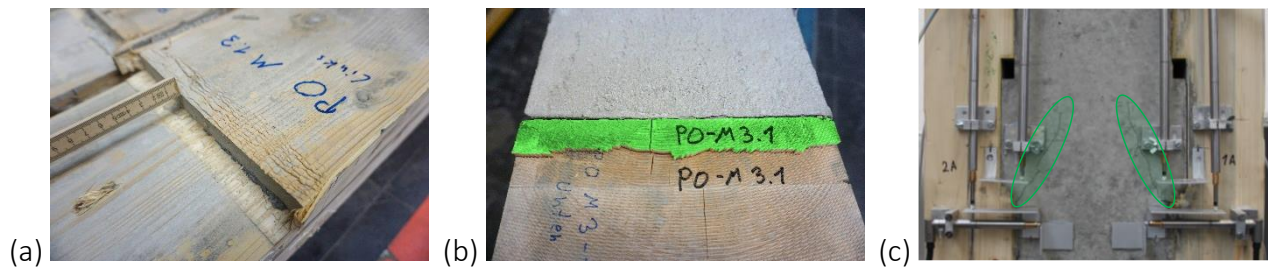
Failure modes and failure progress: (a) Timber compression failure in front of the loaded edge of the notch, (b) Timber shear failure in front of the loaded edge of the notch, (c) Concrete failure as cracks starting from the loaded edge of the notch.
